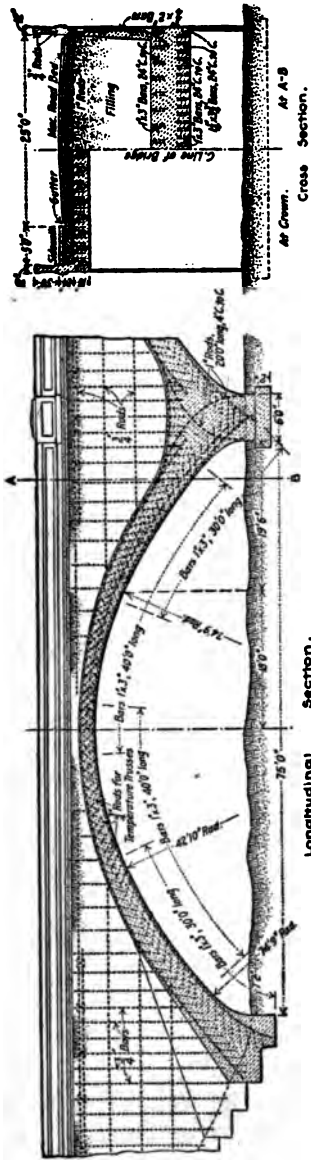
Parabolic Arch Bridge at Wabash, Ind.
